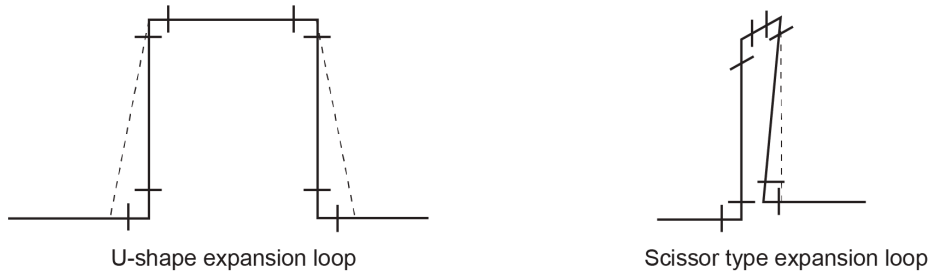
Plan views of U-shaped and scissor-type expansion loops.
